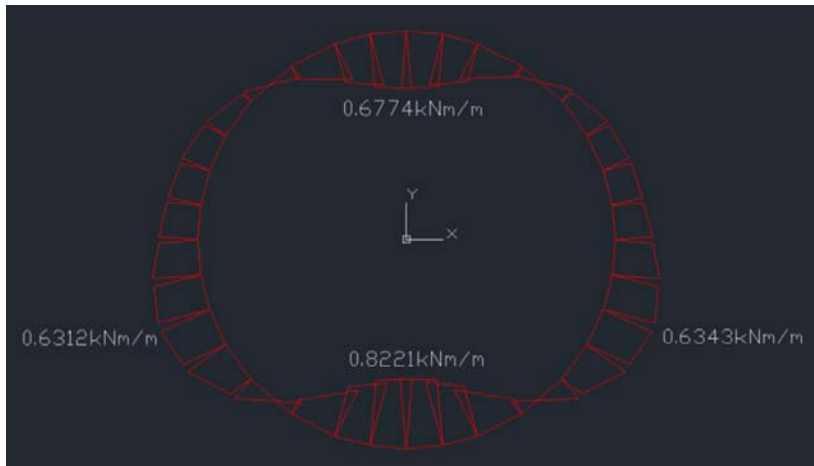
Predicted Pipe Wall Bending Moments for Case H4 (Soilcrete).
